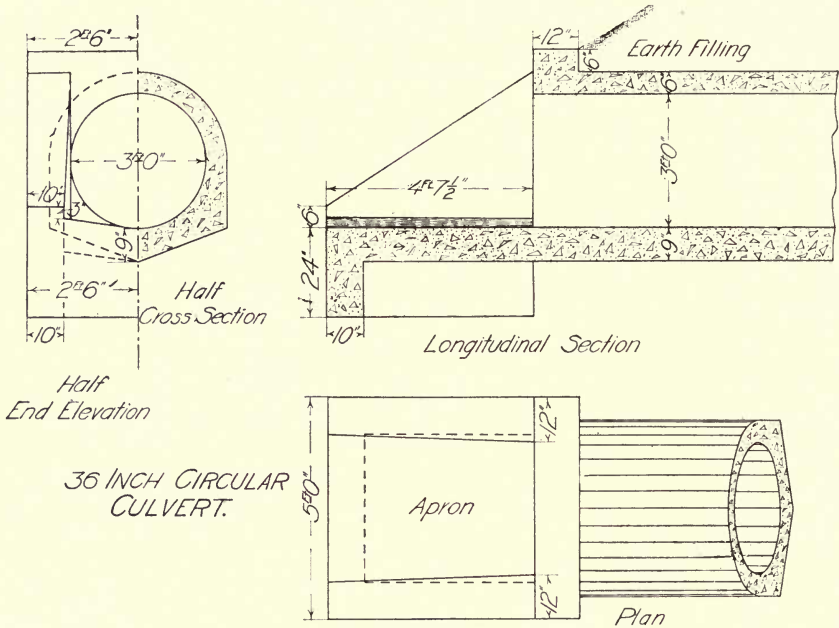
CONCRETE CIRCULAR CULVERT.
